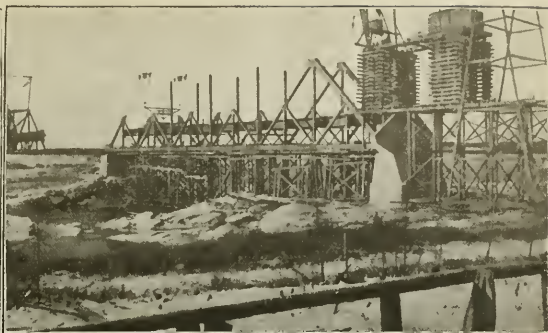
Lower Steelwork for Northern Anchor-span Erected; Traveller Raised on Blocking, for Working on Top-chords
